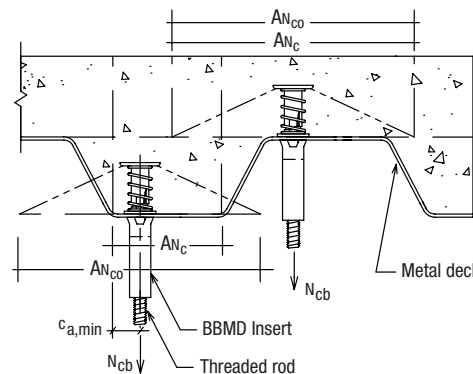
Idealization of concrete on deck; determination of concrete breakout strength in accordance with ACI 318.
